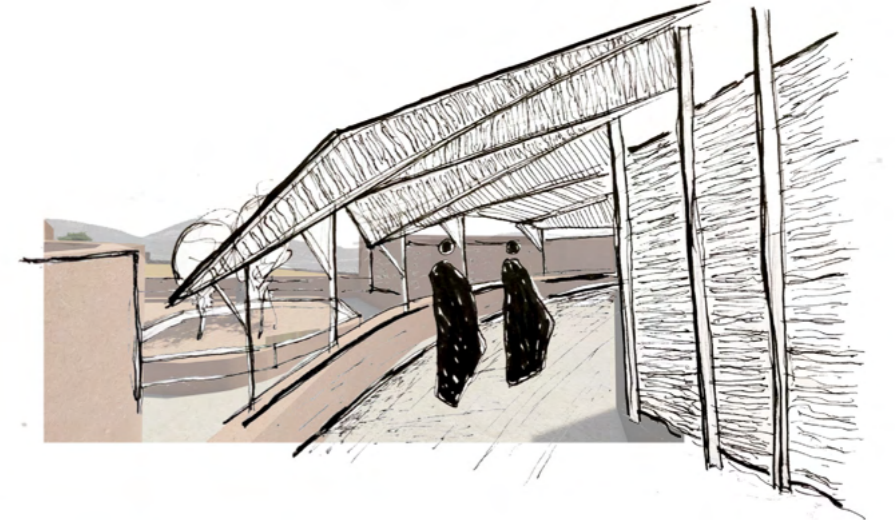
Design Approach 2 Ritual Pavilion Perspective (Author, 2021)
